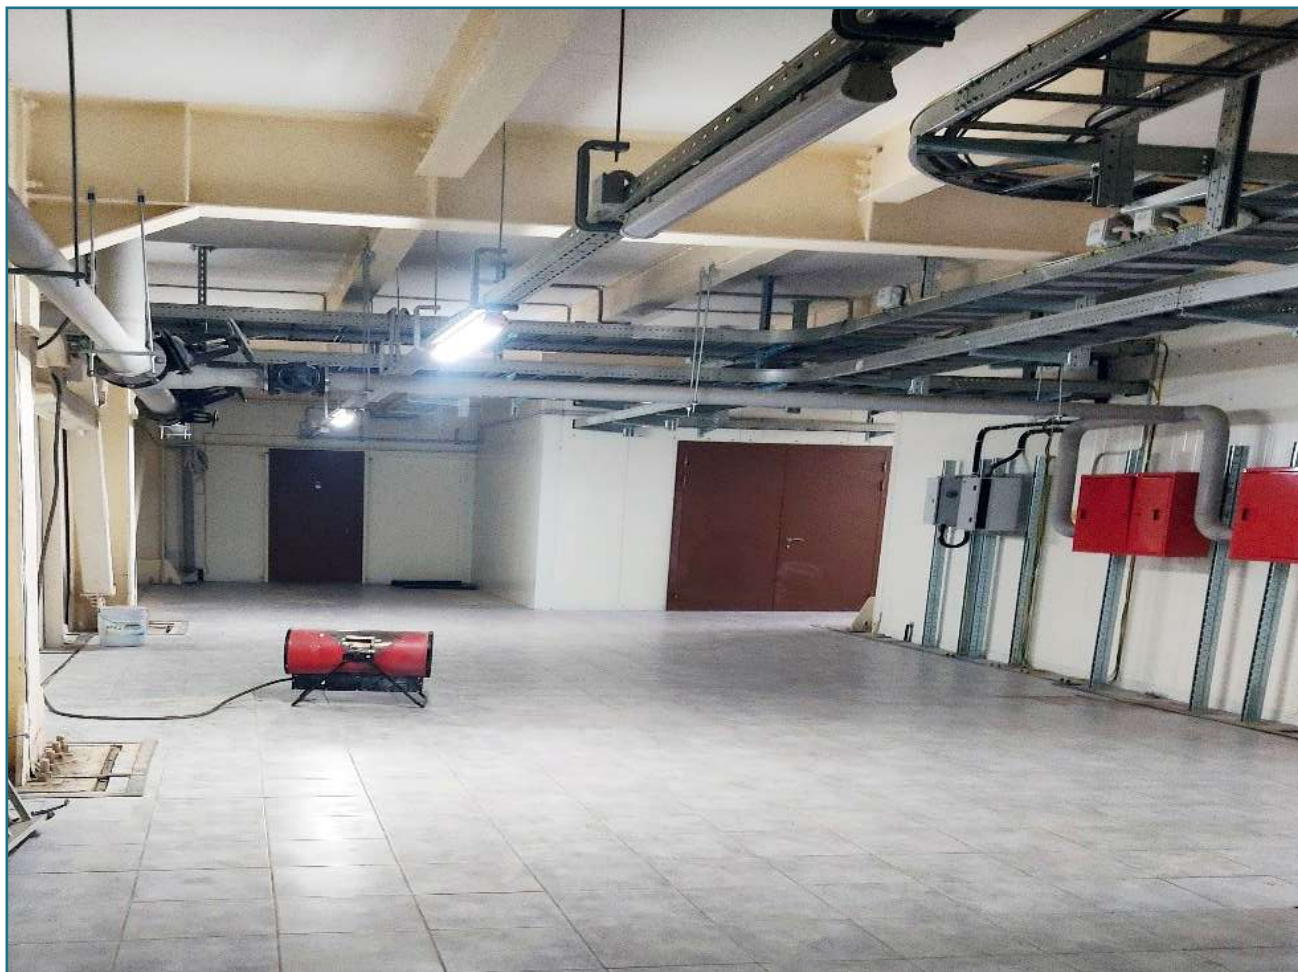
The URL construction, Zheleznogorsk, Krasnoyarsk krai, building 1.24 – engineering unit
